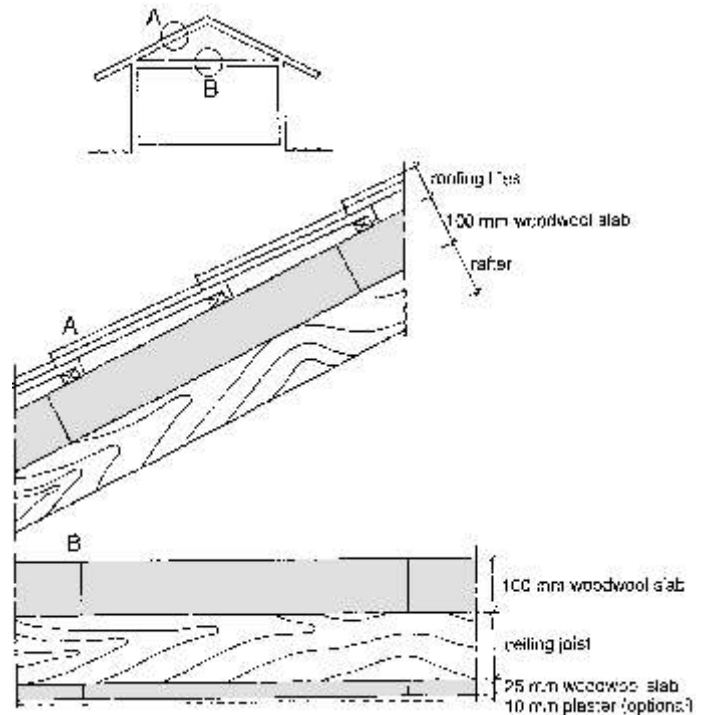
Woodwool slabs used in pitched roofs. A. Slabs nailed to the rafters as a base for the roofing material. (Using 100 mm thick woodwool slabs gives a U-value of 0.6 W/m²K). B. Slabs nailed to the ceiling joists. A thinner slab is used as a ceiling. (Using 100 and 25 mm thick woodwool slabs gives a U-value of 0.5 W/m²K).
